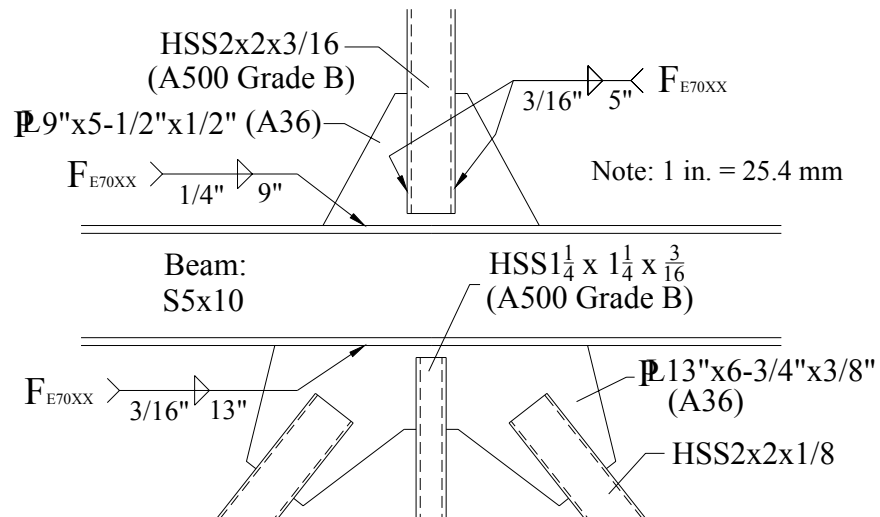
Zipper-brace-beam connections on the 3rd -floor level.
